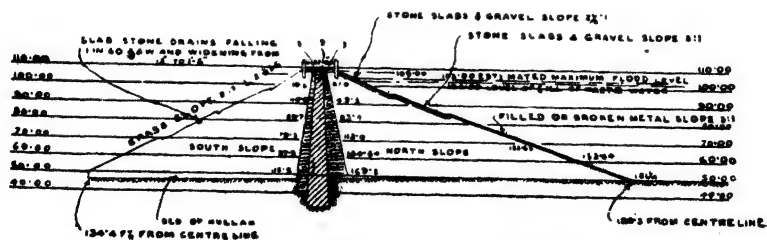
Cross section of an Earthen Dam, Bangalore Water Supply.
